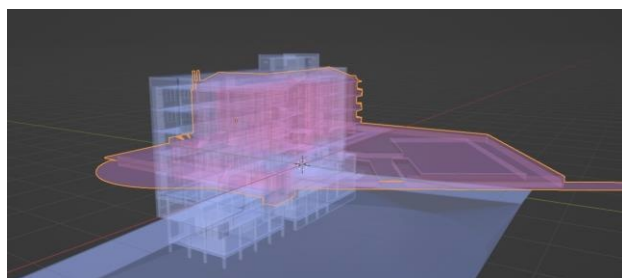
Intersection of the real building (in blue) and the demonstrated building (in pink)
